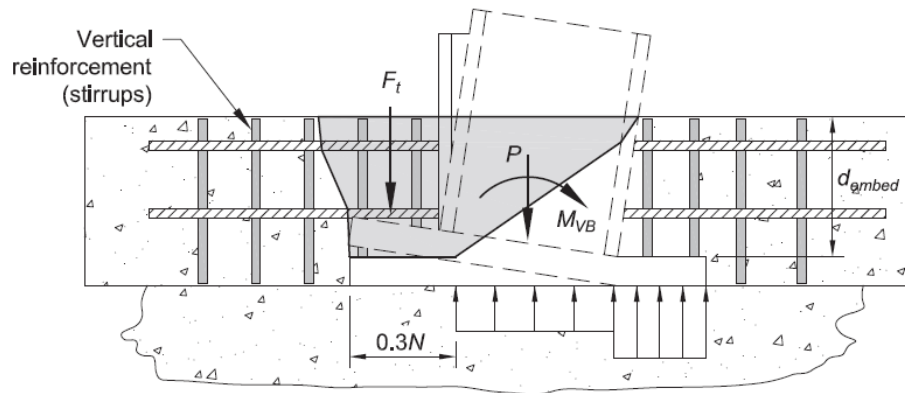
Breakout force of concrete above the tension side of the connection.
